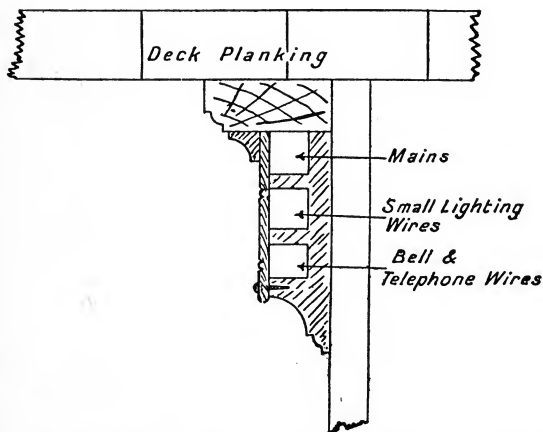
SECTION OF MOULDING, SHOWING GROOVES FOR WIRES.
